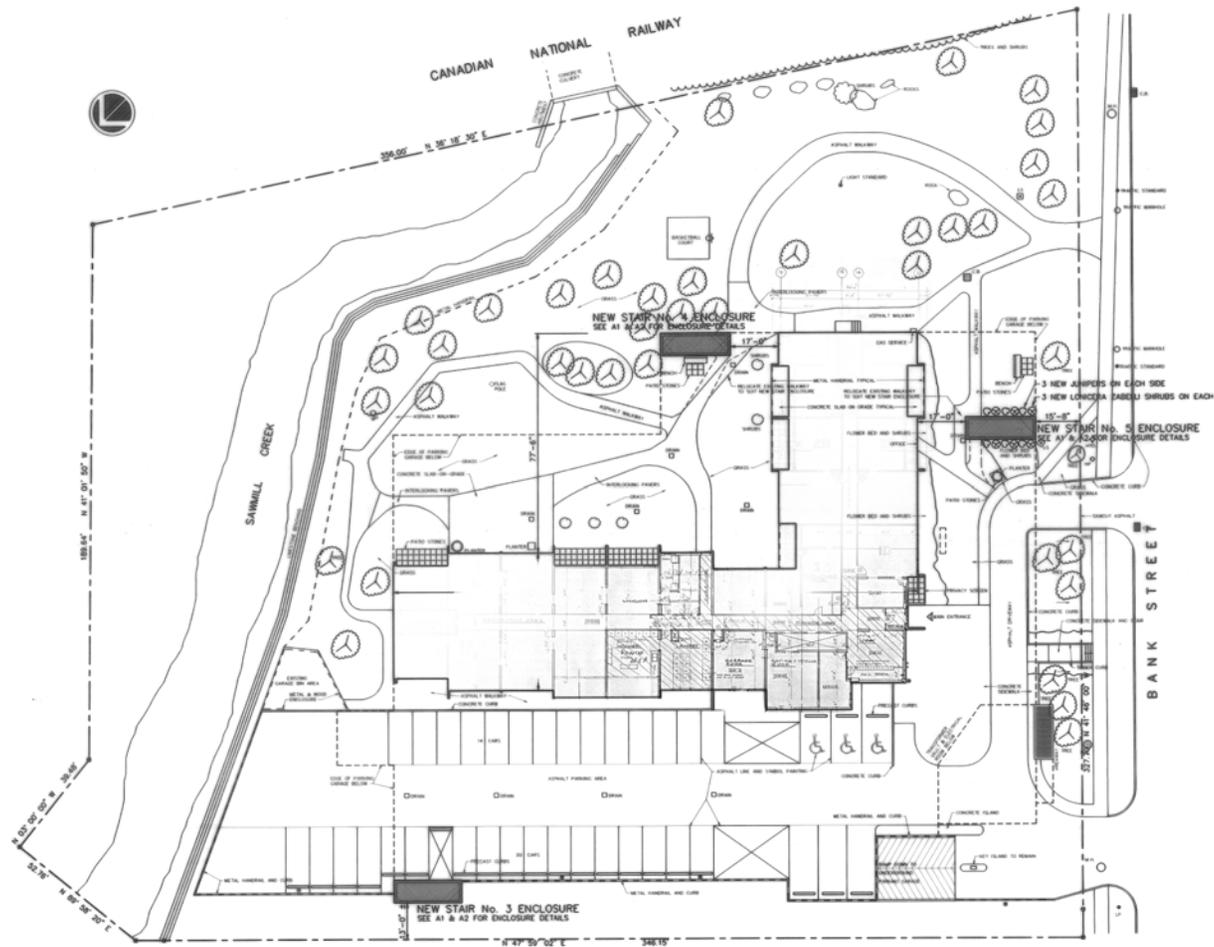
existing site plan with existing ground floor amenities. Source images for illustration: OCH.
